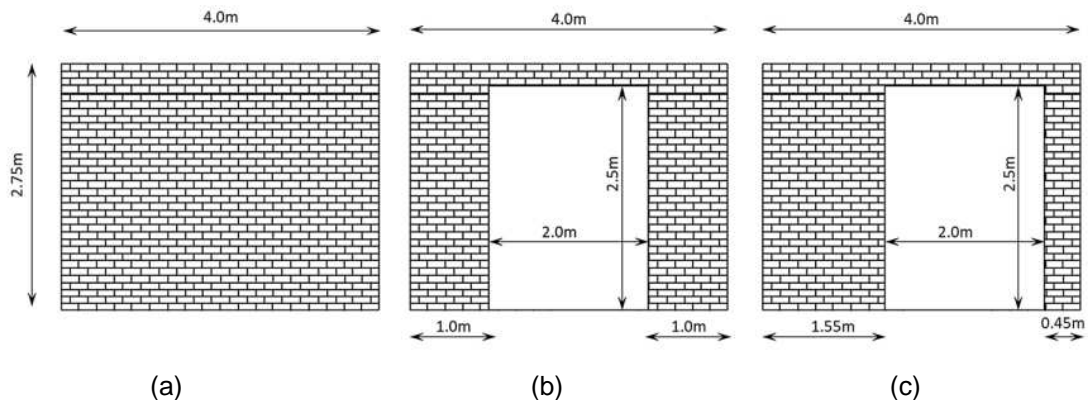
The geometry of the models developed: (a) masonry wall panel with no opening/solid wall; (b) wall panel with symmetric opening; (c) wall panel with asymmetric opening.
